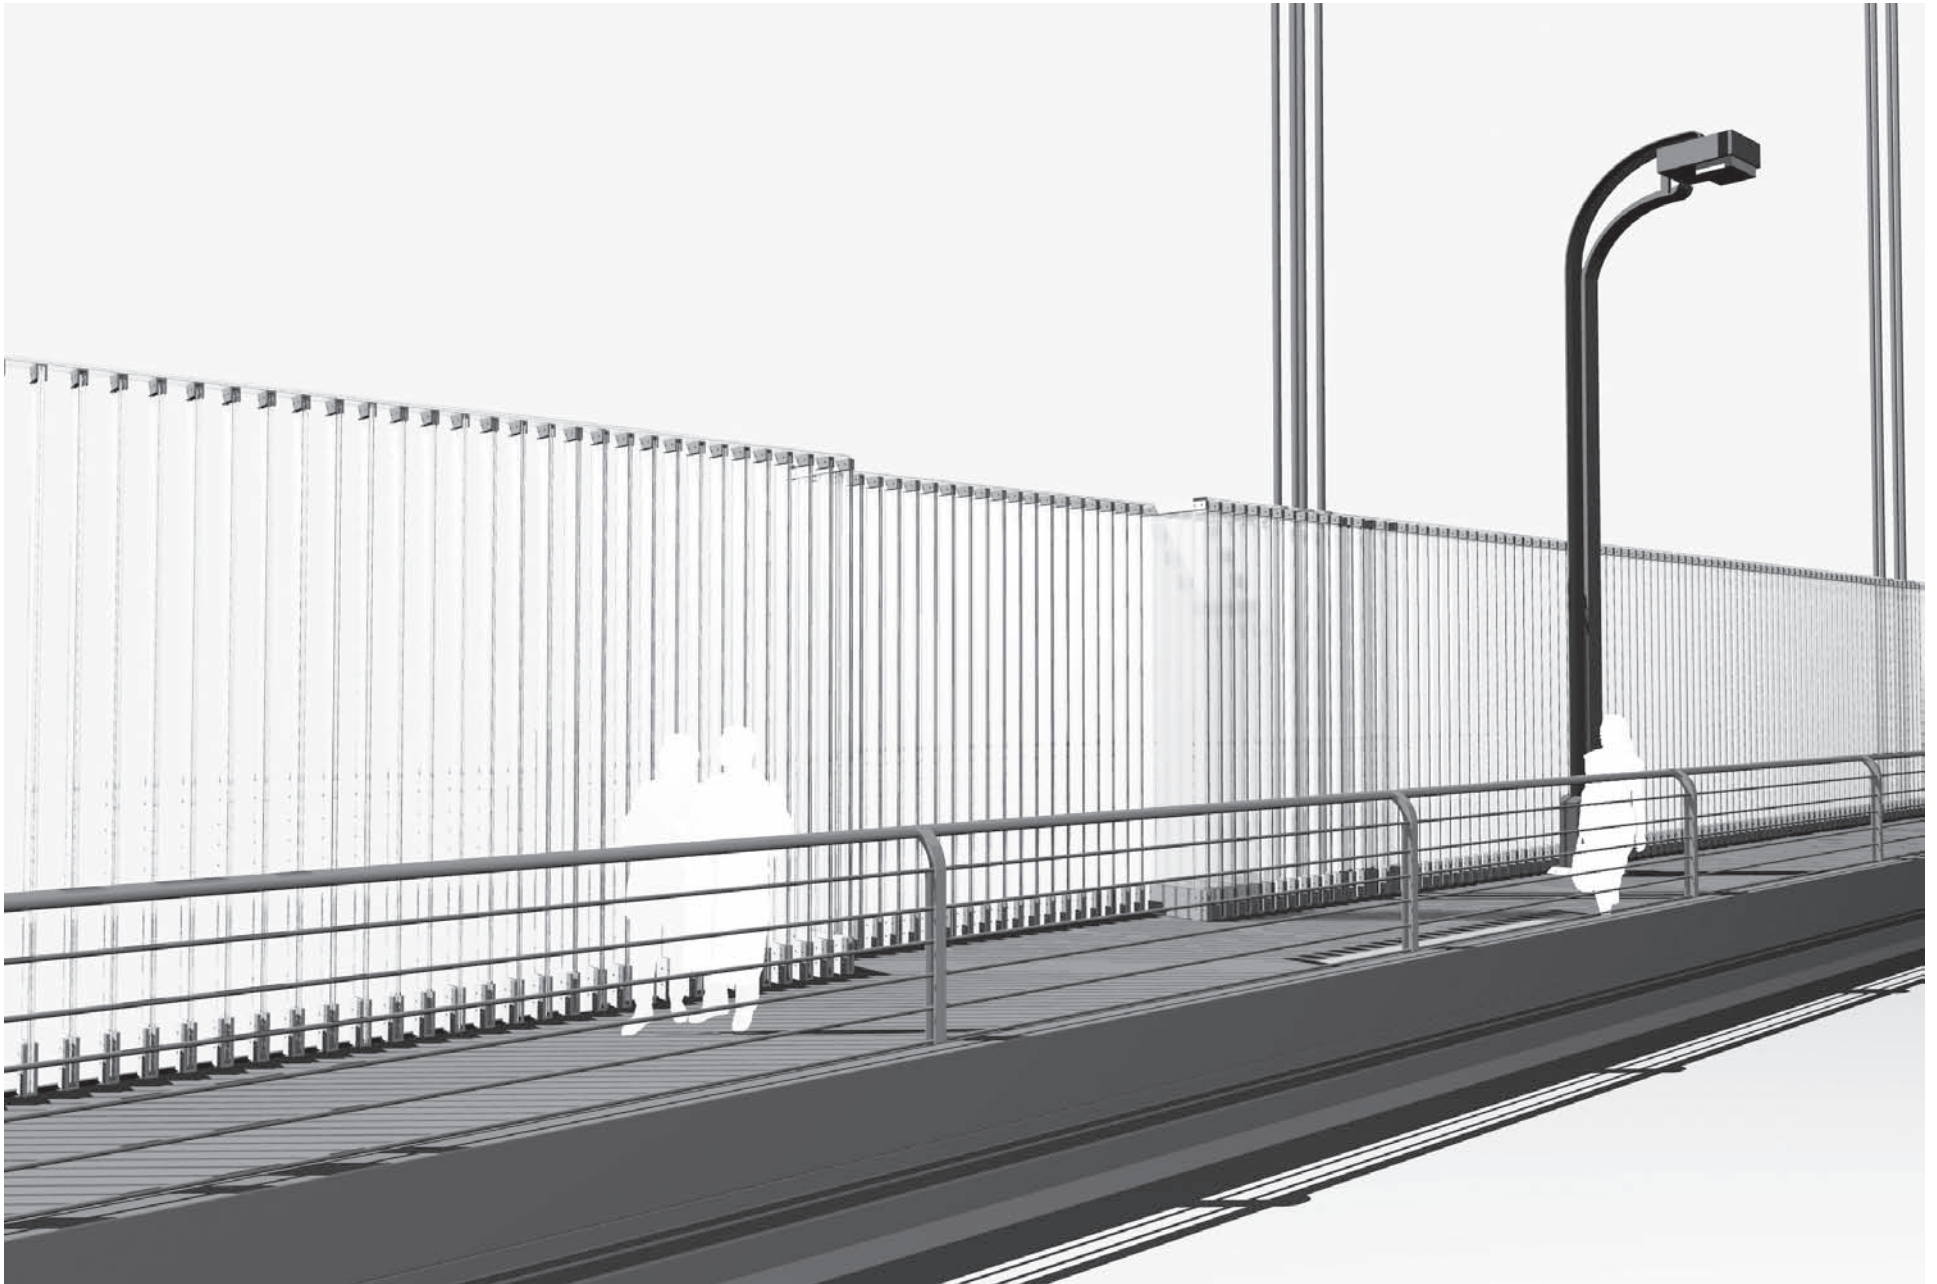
EXAMPLE OF CONCEPT 2 (EXAMPLE SHOWN WITH HEIGHT OF 12'-0", NO WINGLET; WIND FAIRINGS ON TRUSS AND SIDEWALK, VERTICAL GLASS PICKETS SPACED AT 7", SOLID RATIO OF 23%) *VIEW FROM ROADWAY
